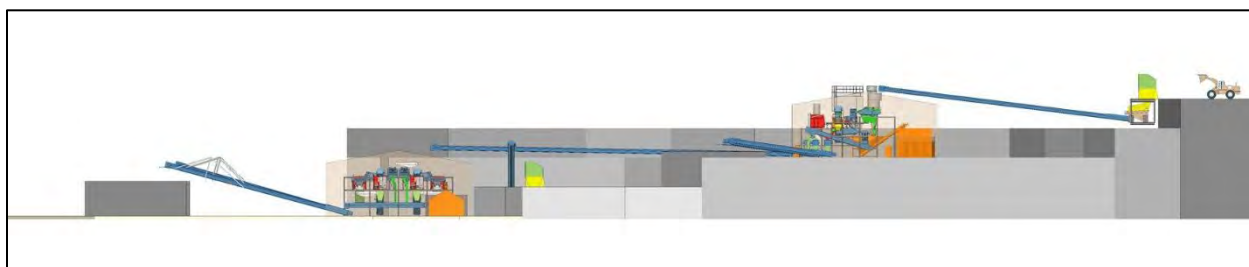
Side View and Topography Cross Section of Possible Processing Facility Placement
